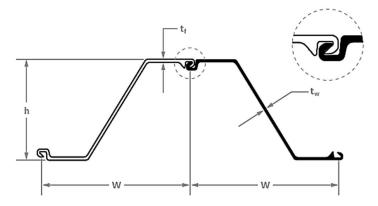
Sheet pile wall pre-fabricated sections (Z-type).
